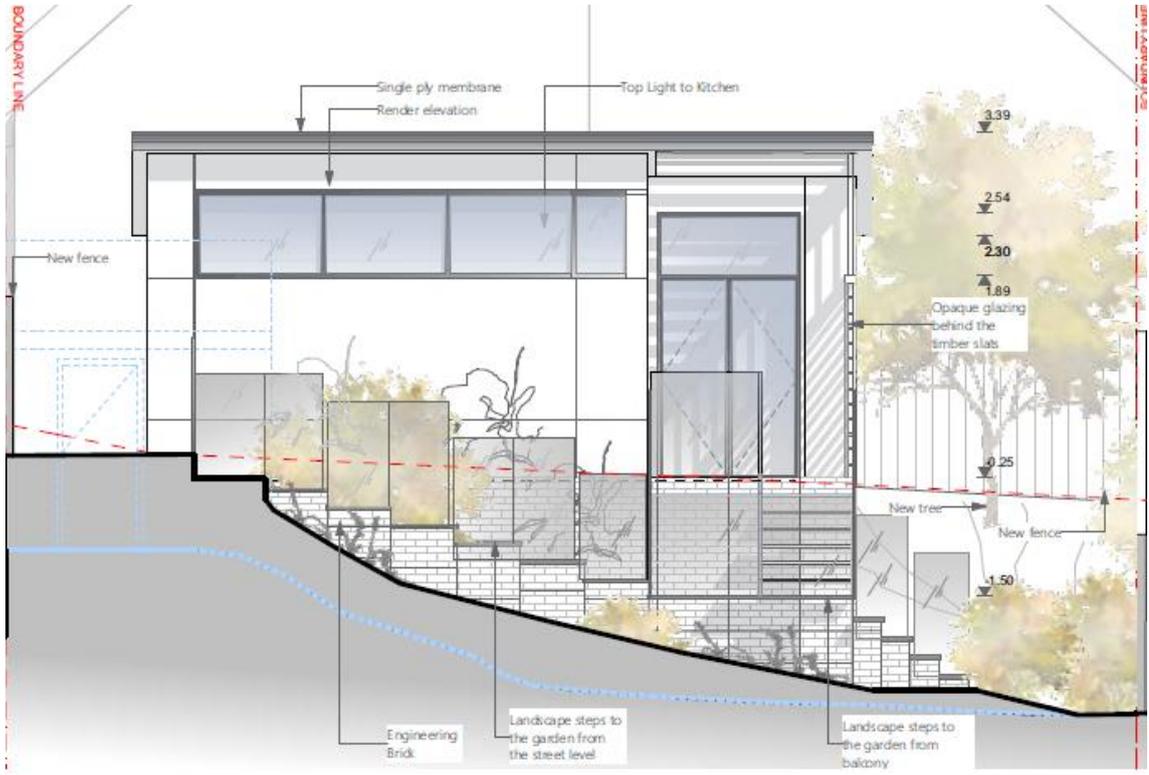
Rear elevation as proposed on APP/C5690/W/21/3268826
